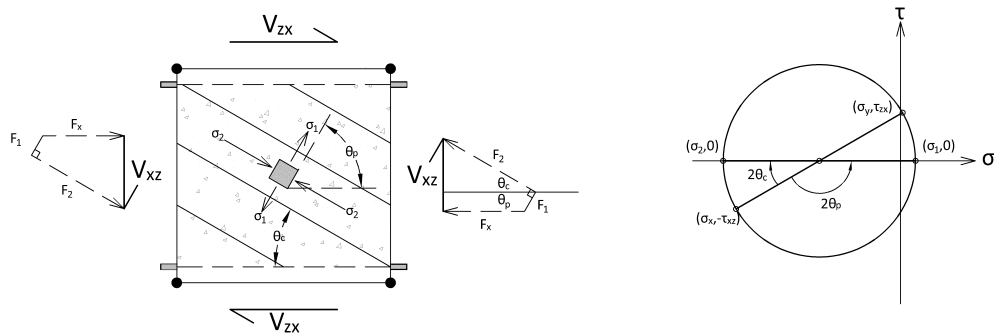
Force Equilibrium (Left) and Stress State (Right) for Shear in Cracked Reinforced Concrete
